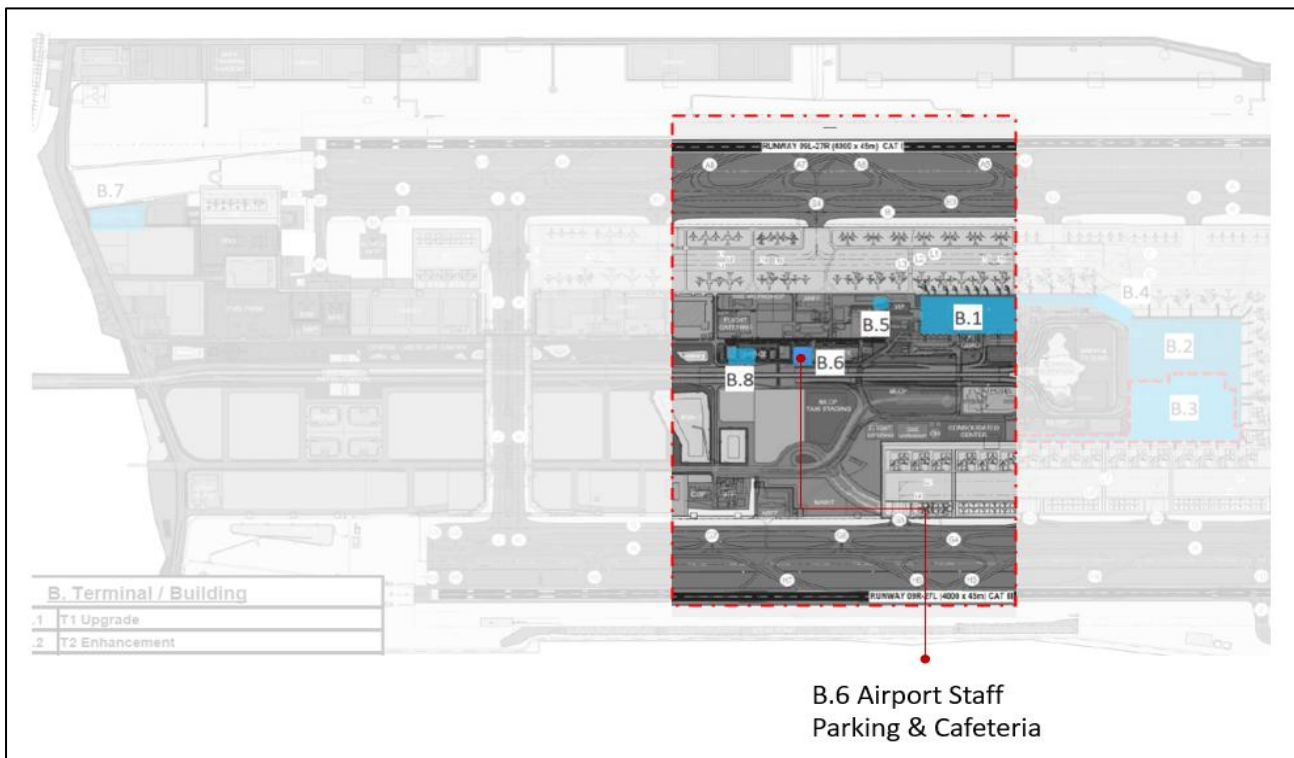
Location of the Proposed Airport Staff Parking and Cafeteria Facilities
